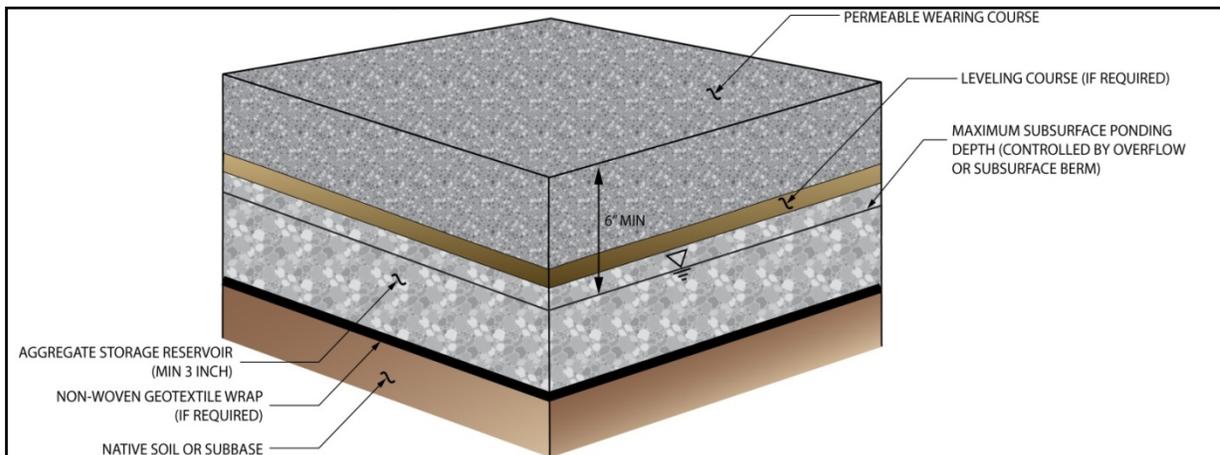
Typical Permeable Pavement Facility Section - (Maximum ponding depth kept to a minimum of 6" below the surface of the wearing course to prevent saturation of wearing course and possible freeze/thaw damage)
